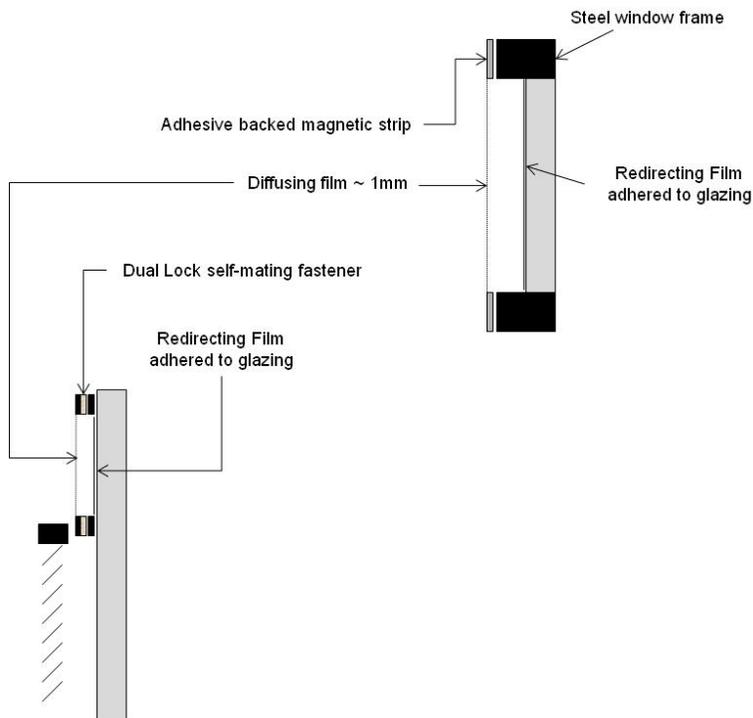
Adhesive backed magnetic strip and self-mating fastener to attach a 1 mm diffusing film to the frame.
